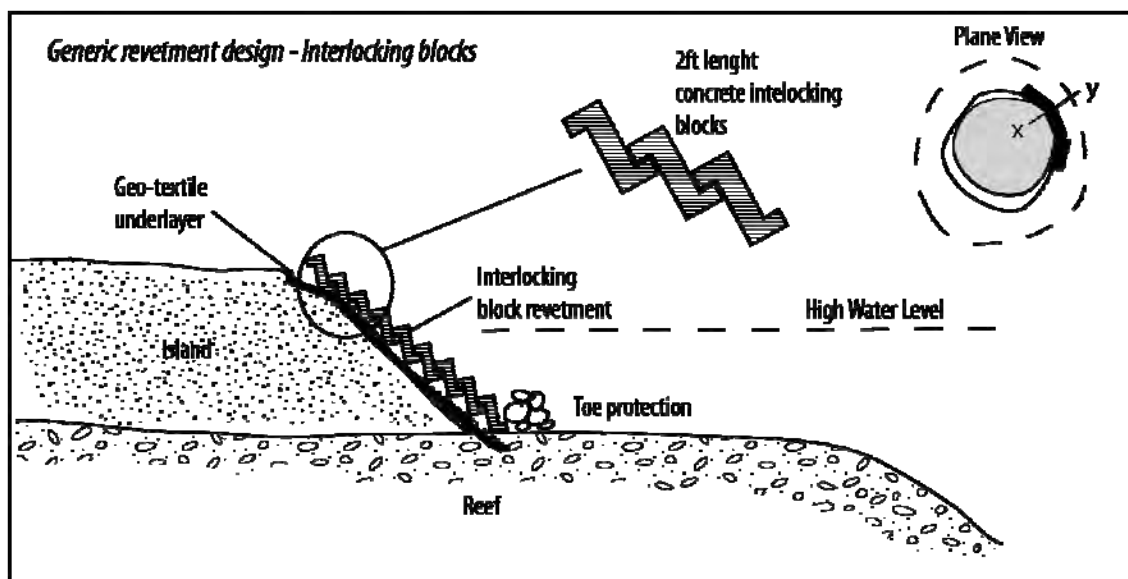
Generic revetment design – Interlocking concrete blocks
